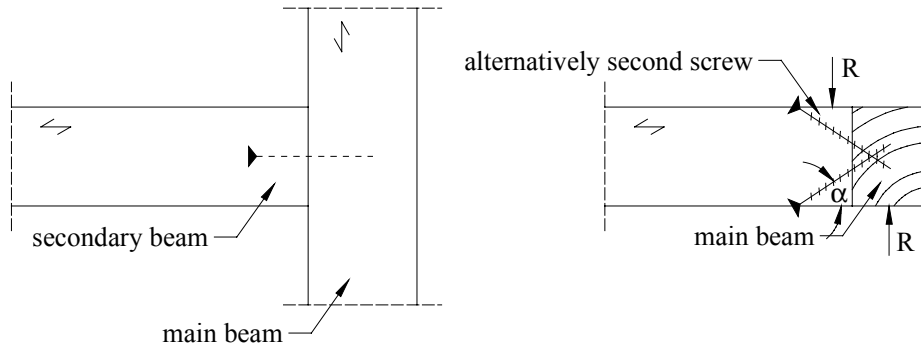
Schematic representation of a secondary beam - main beam connection using inclined screws
